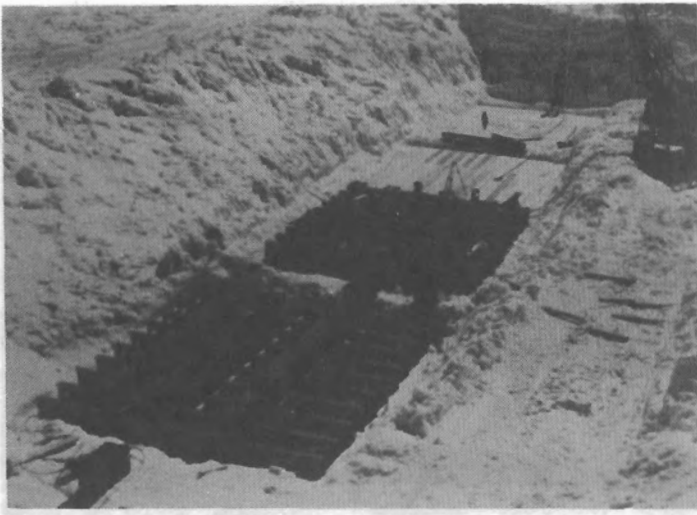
New footings (photo by R. McLemore, Metcalf & Eddy Inc.).
